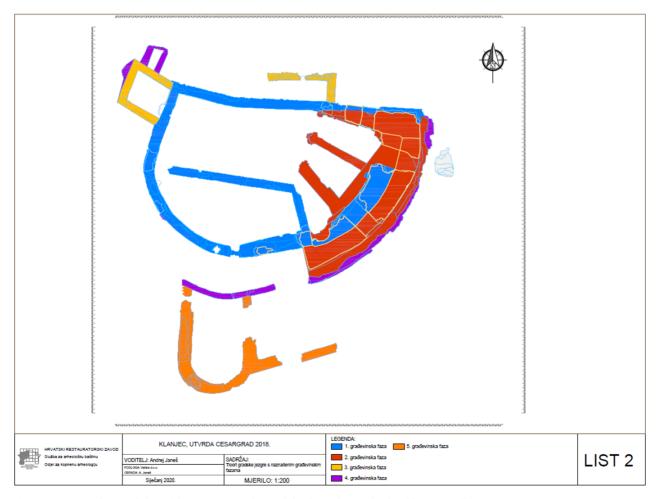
Cesargrad groundplan with construcion phases. (Plan by: Vektra Ltd, edited by: A. Janeš).
